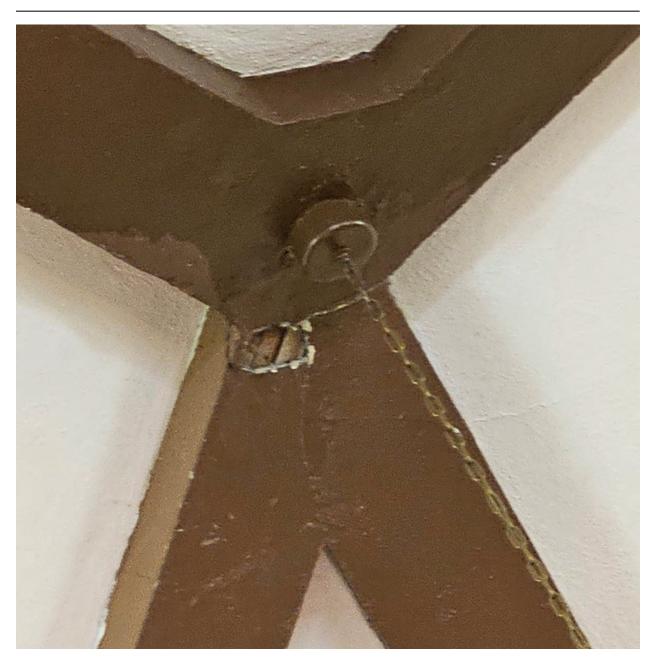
Beam damage in Sanctuary showing wood frame
